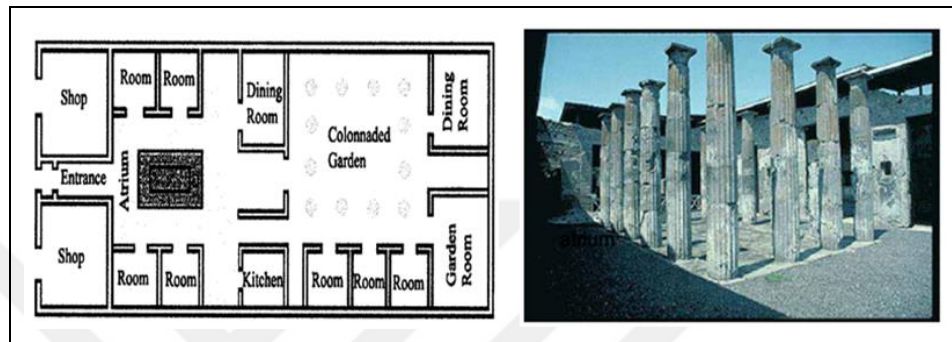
Plan (left) and picture (right) of traditional atrium- peristyle house, A.C.
